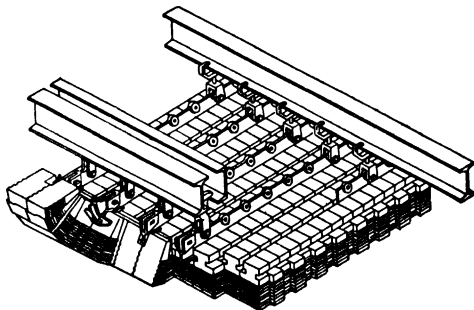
Arch with Detrick tile corrugated on all sides to prevent spalled refractory from falling into the furnace.
